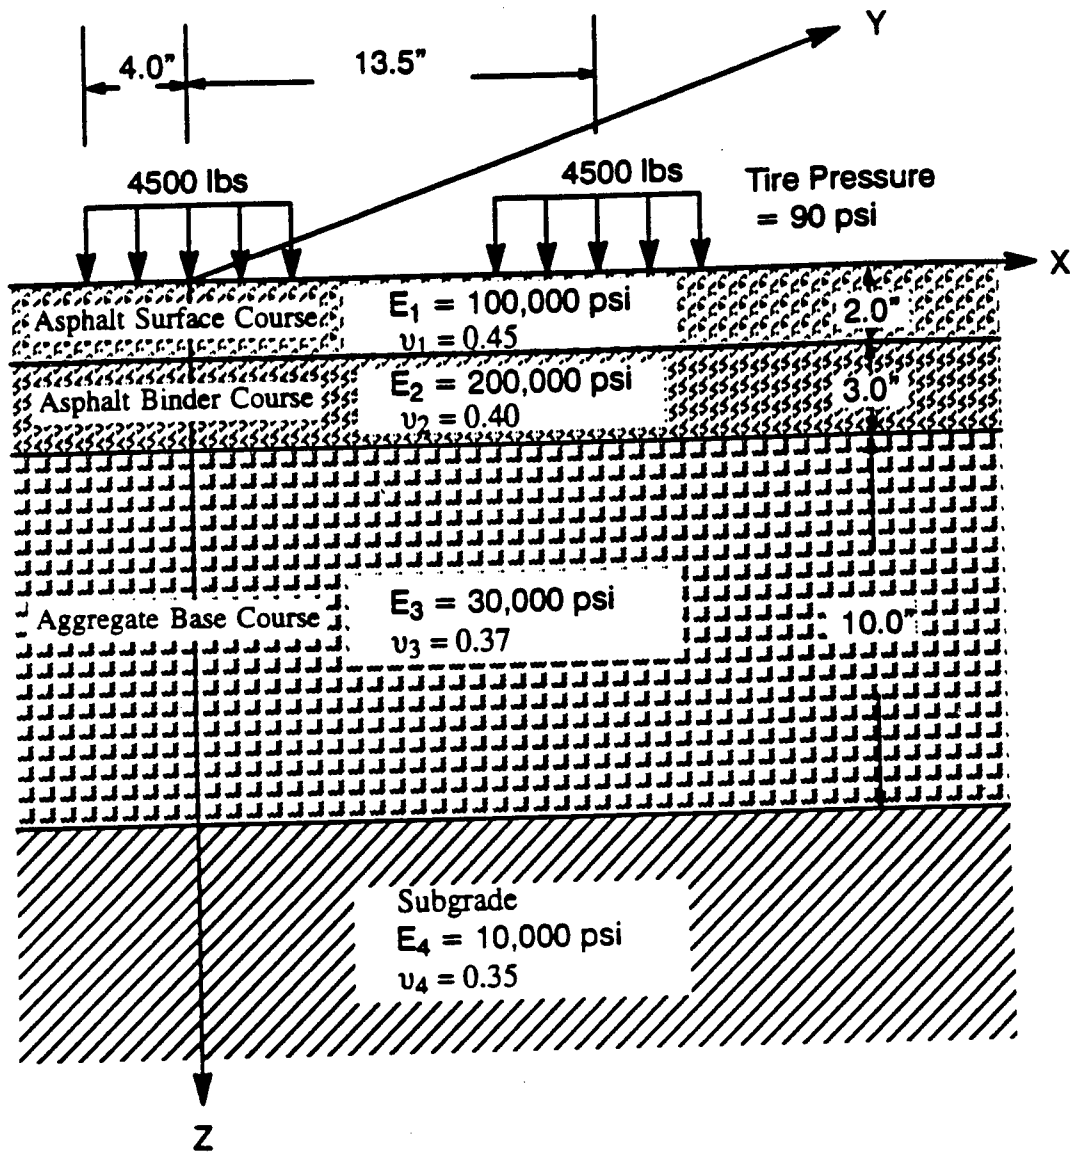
(a) Typical asphalt concrete pavement design type with aggregate base course.
